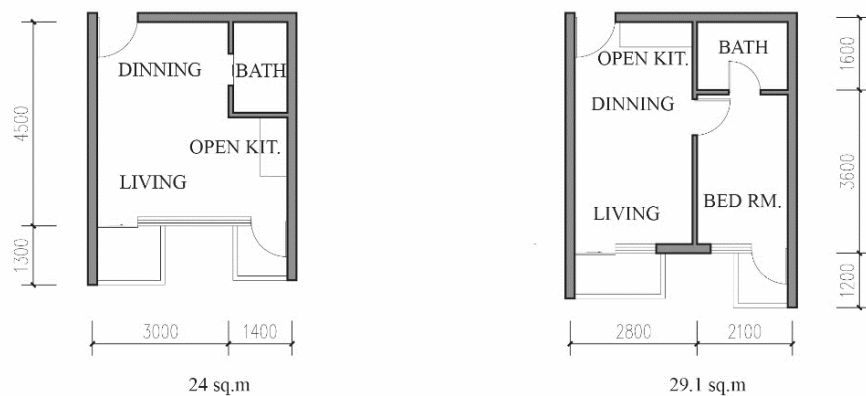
Class A units: typical studio (left) and one-bedroom (right) unit plan (Qin 2015)
